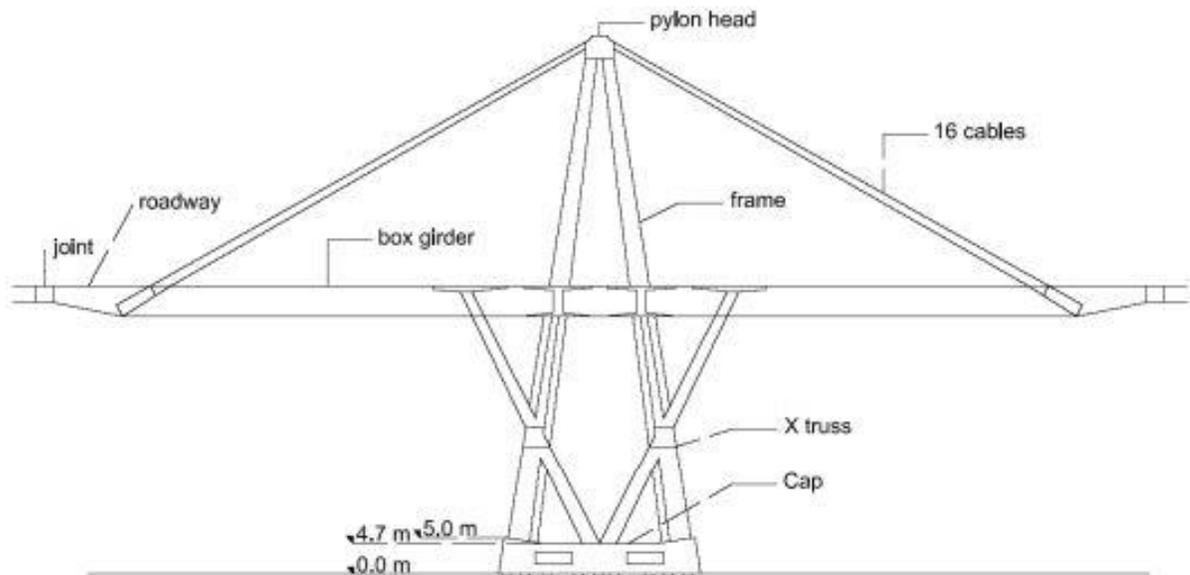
Design scheme of Maracaibo Bridge (Pipinato, 2012)
